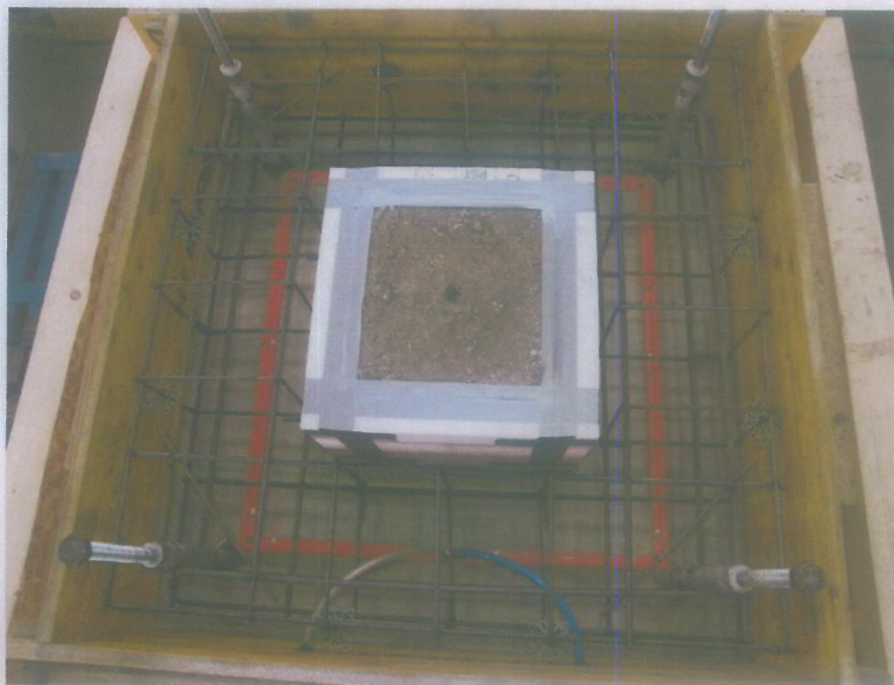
Sealing test specimen with injection profile installed on the base plate before concreting the wall frame
